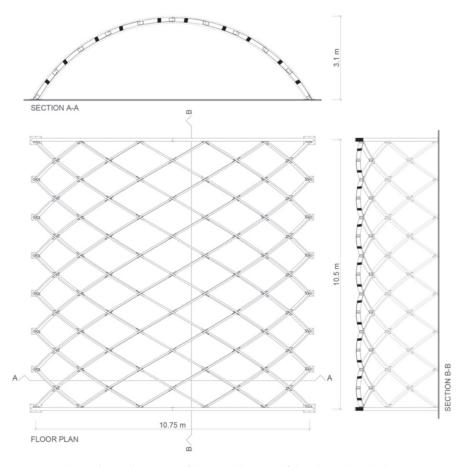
Floor plan and sections of the lamella vault of the physical model.
